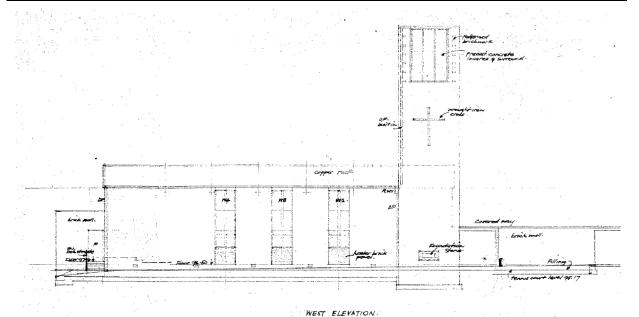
West elevation on Ashburn Street of the new church. (Source: BP 28478)
